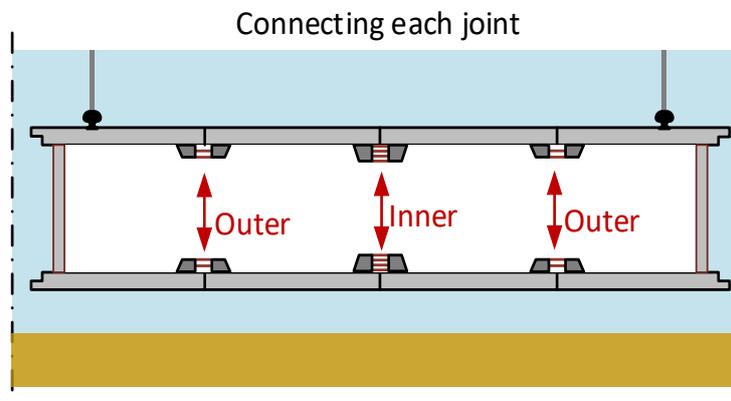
, PRESTRESSING VARIANT 2 LAYOUT; LONGITUDINAL VIEW
